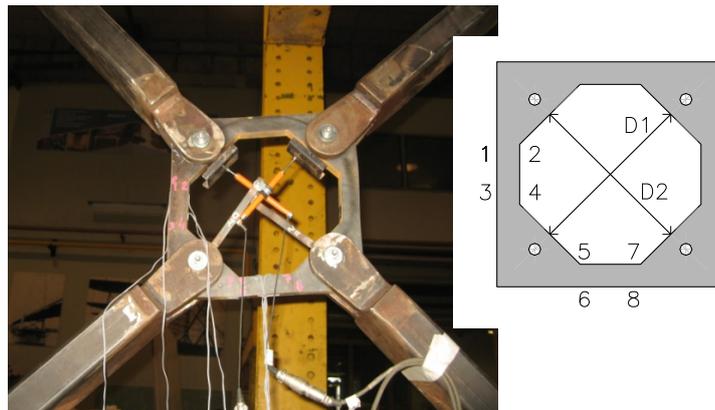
Instrumentation of the damper of Panel P5DHW2. Transducers D1 e D2 and extensometers 1 to 8.
